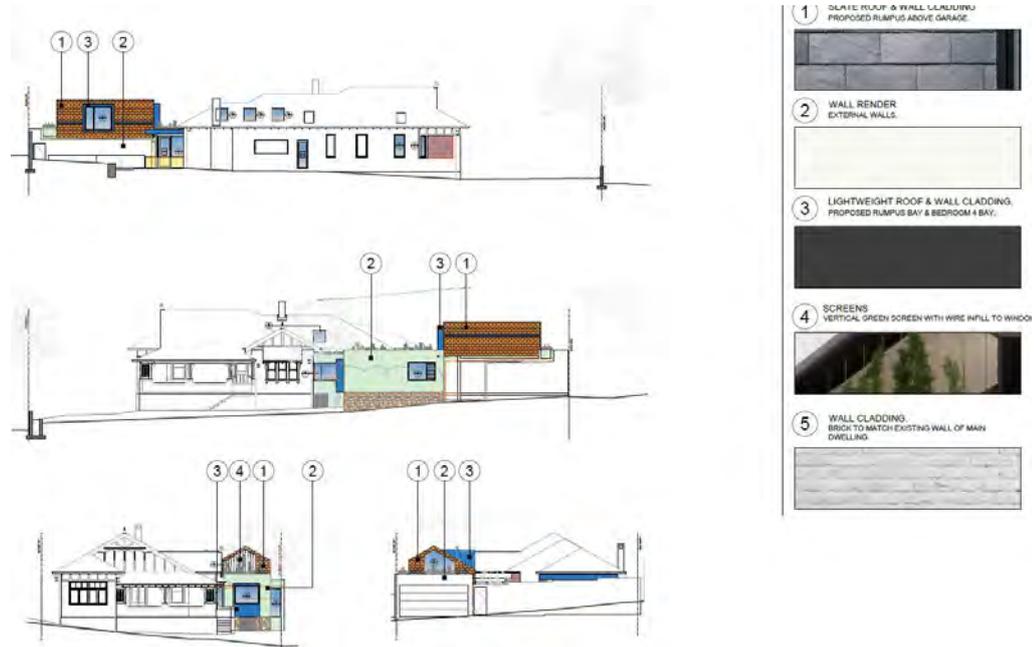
Proposed external materials and finishes. (Source: Castlepeake Architecture)
